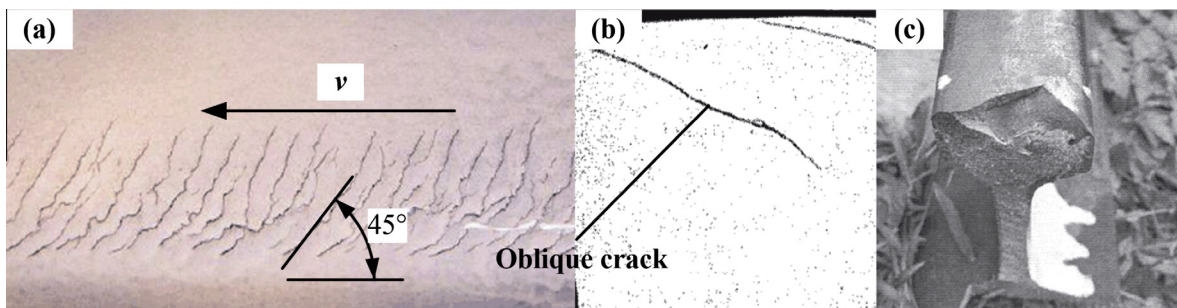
(a) Top view of multi RCF cracks, (b) section view of a RCF crack, and (c) ruptured RCF crack.
